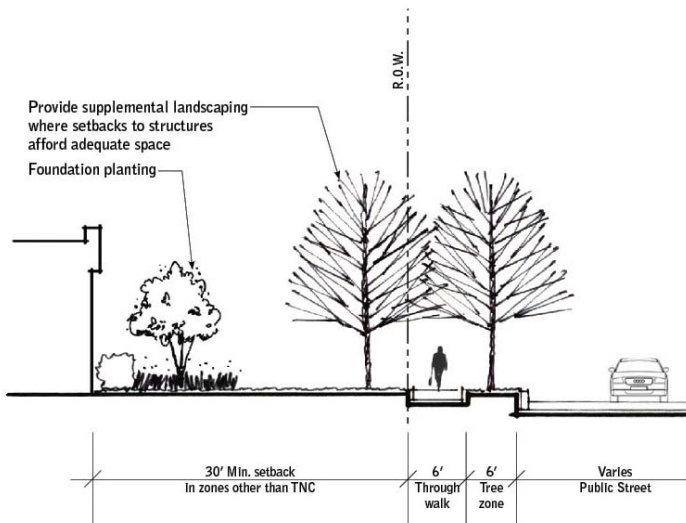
K: Building Setback from Public Street R.O.W. (Non- TNC Zones)
